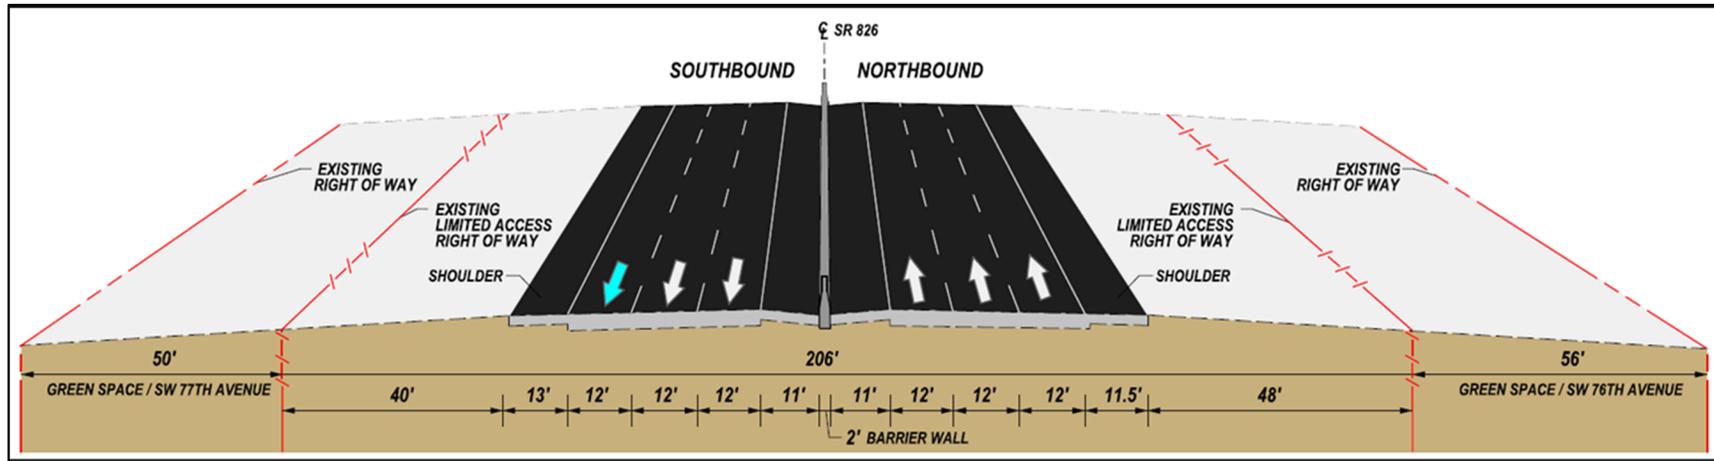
Existing Roadway Typical Section between US 1 and SR 874
